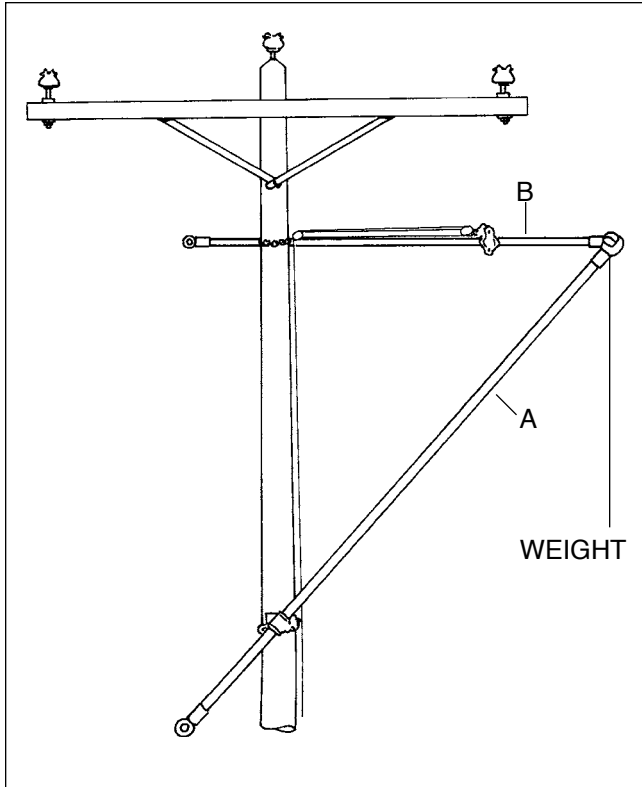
Wire Tongs with saddles and wire tong blocks clamp on holding stick.
